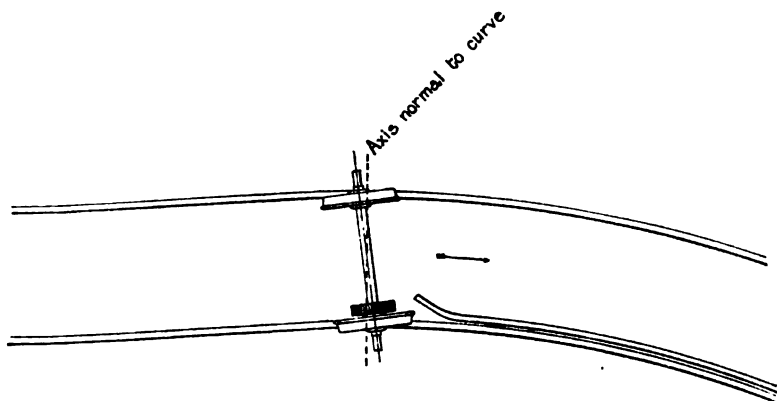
Unsymmetrically Driven Axle striking Check Rail.
